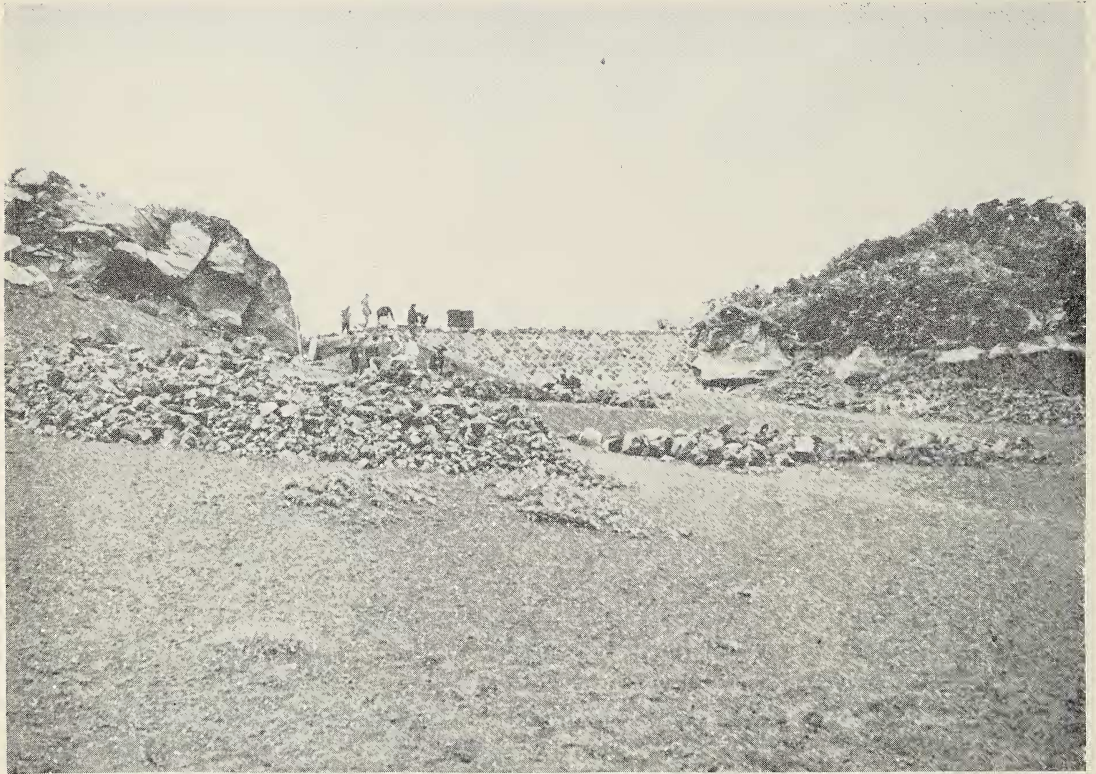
Masonry wall built across a gap in the wall of Oshima caldera, Japan, in 1951, to prevent lava from spilling through the gap and endangering the village of Nomashi. Photo by Helen L. Foster, U. S. Geological Survey.
